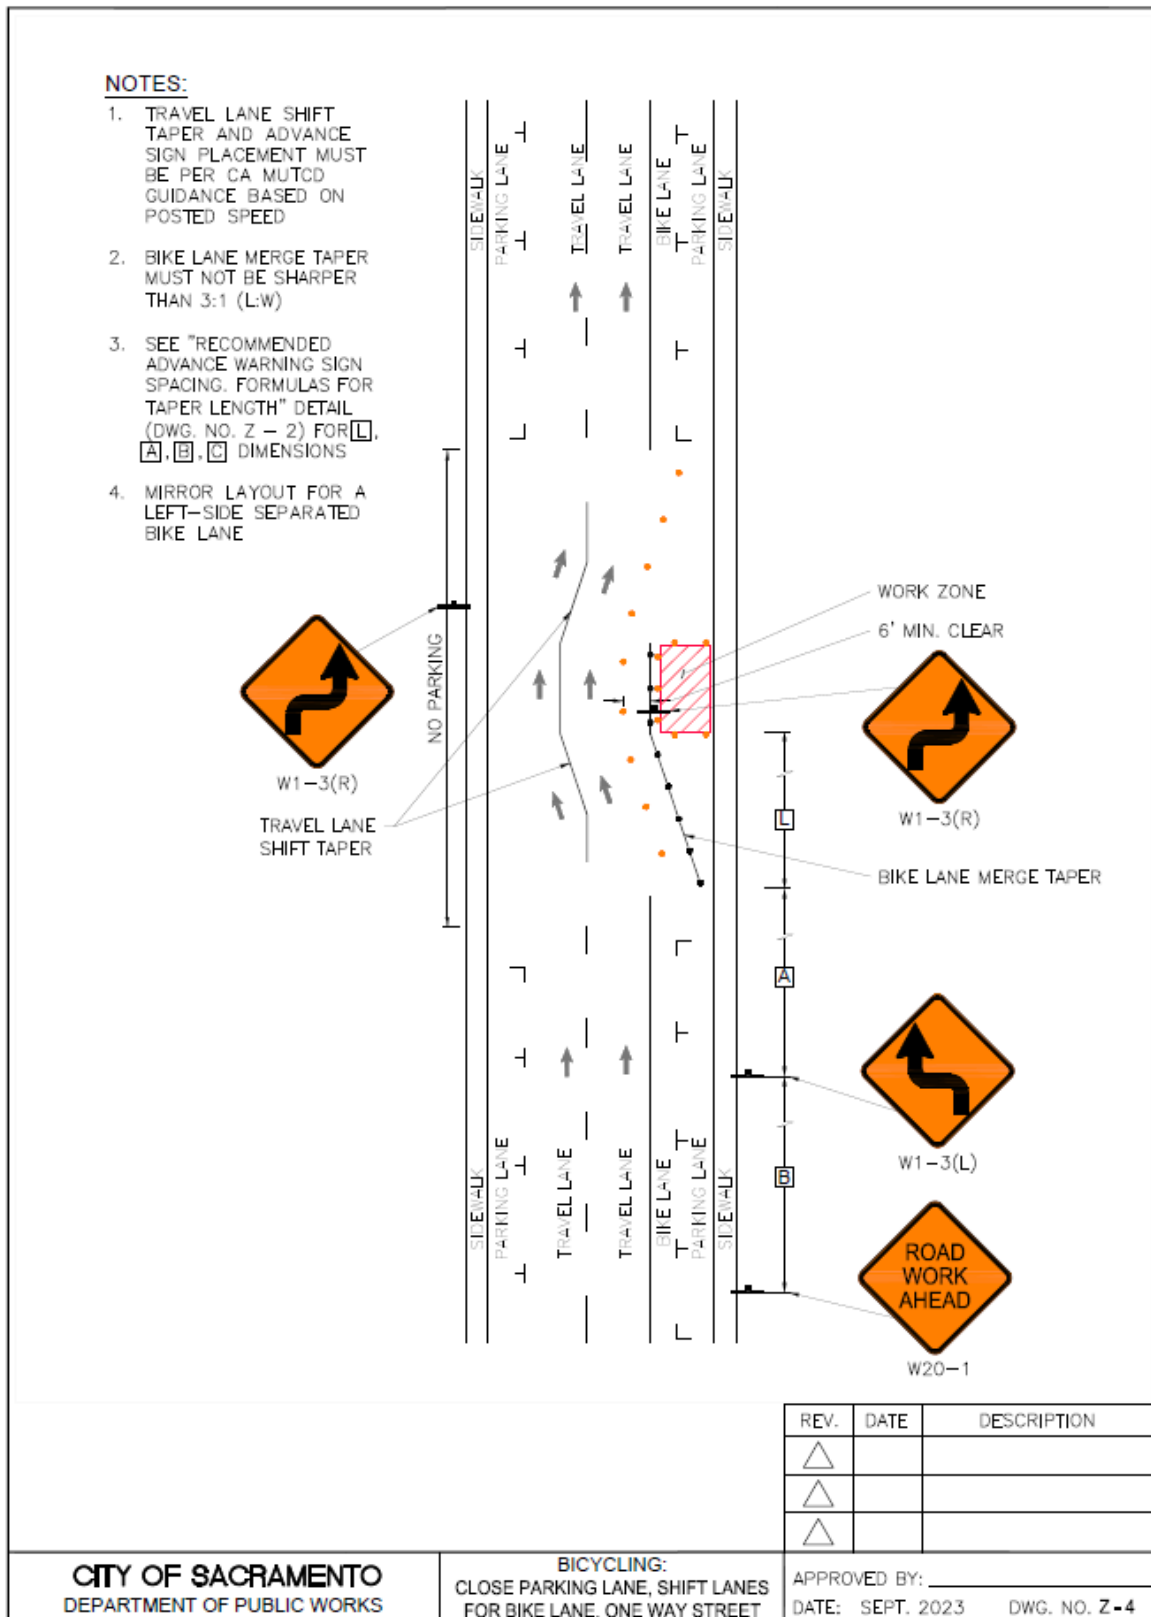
Bicycling: Close Parking Lane, Shift Lanes for Bike Lane, One Way Street
